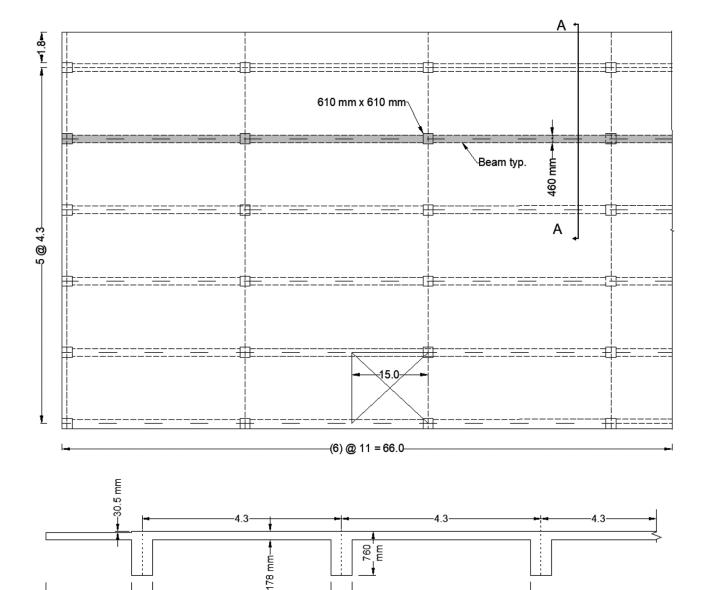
Framing plan and partial section A-A showing interior beam. (Note: Dimensions in meters unless otherwise indicated.)
